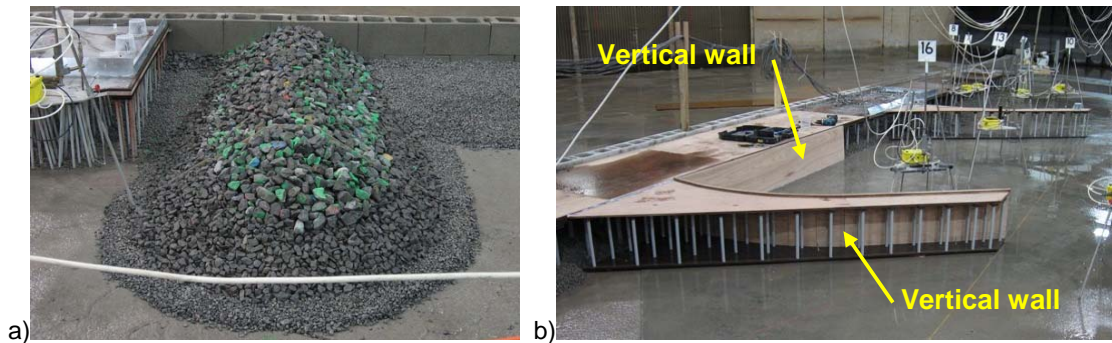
a) New spur breakwater attached to Navy Pier for harbor layout 8;
